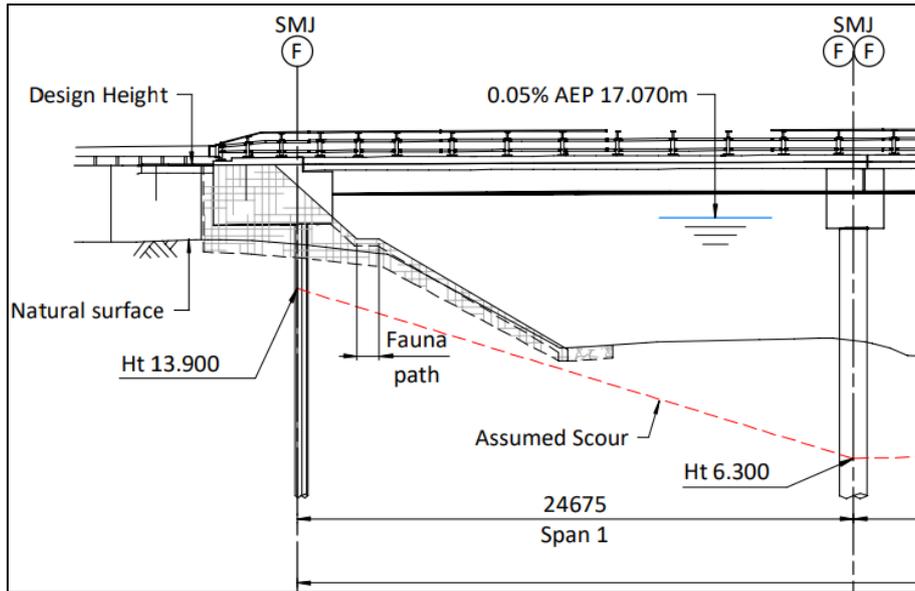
Wrights Ck Bruce Highway Bridge General Arrangement Exert
